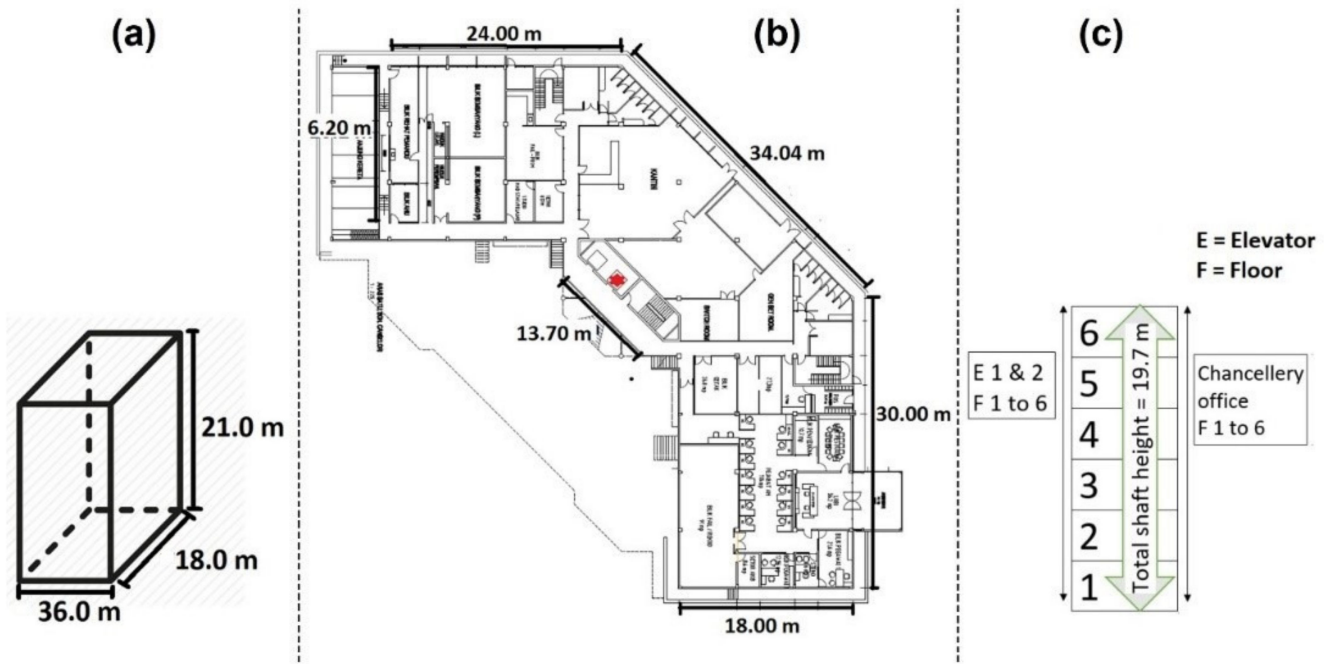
LO (a) building dimensions, (b) building floor plan, and (c) function and operating lift of different floors.
